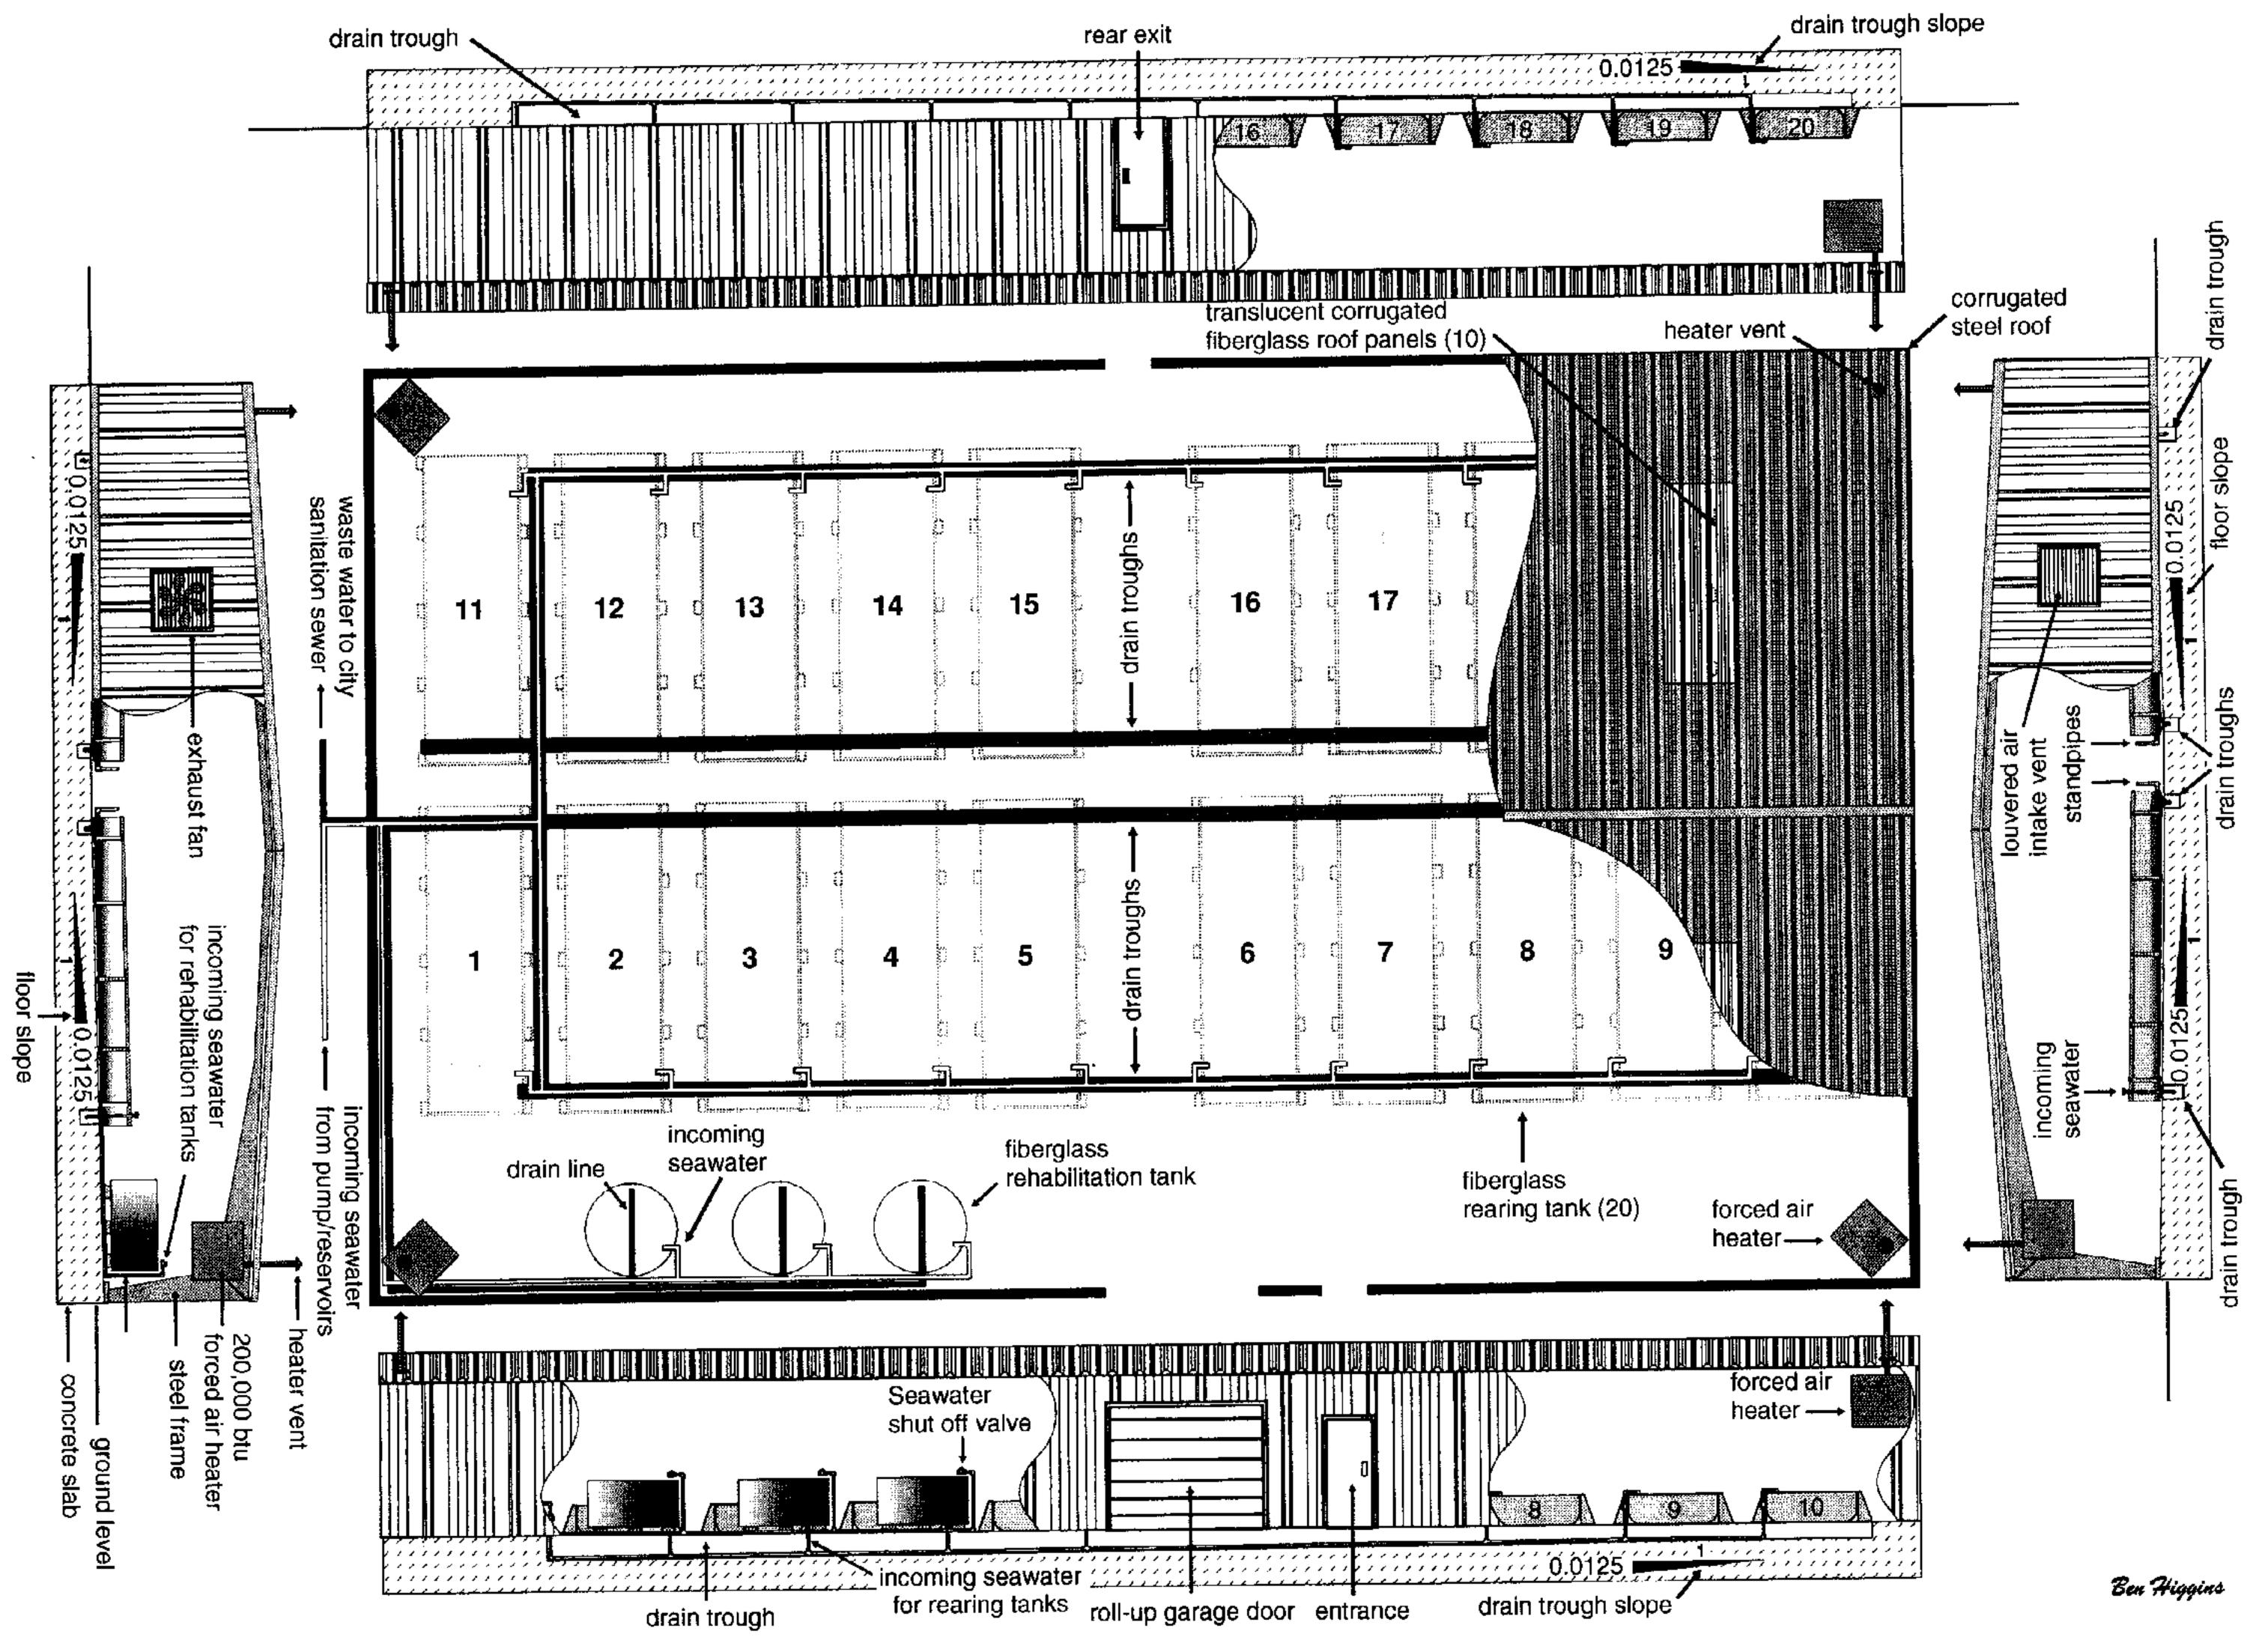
Plan and elevations of the sea turtle rearing building, showing rearing tanks and drainage troughs.
